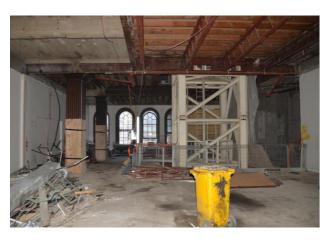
Typical flooring detail at underside showing concrete slab at south wall and 1970s infill of lightwell. (Source: GML 2017)
